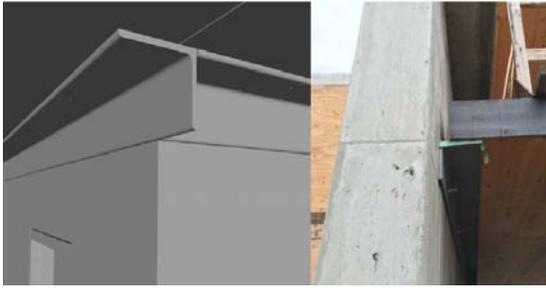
Typical connection between core and CLT floor; Left: 3D model (Courtesy CADMakers), Right: Picture
